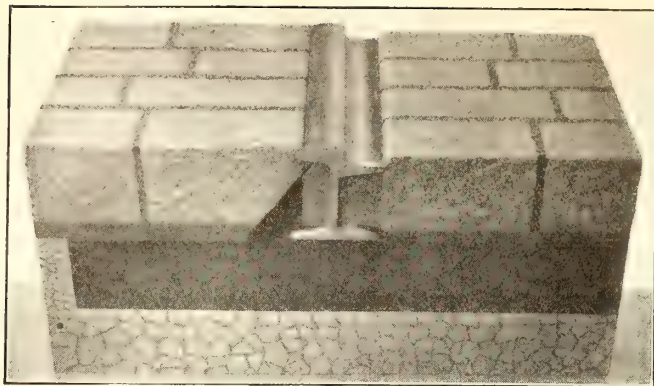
LORAIN TRAM GIRDER SECTION, NO. 101-486,
